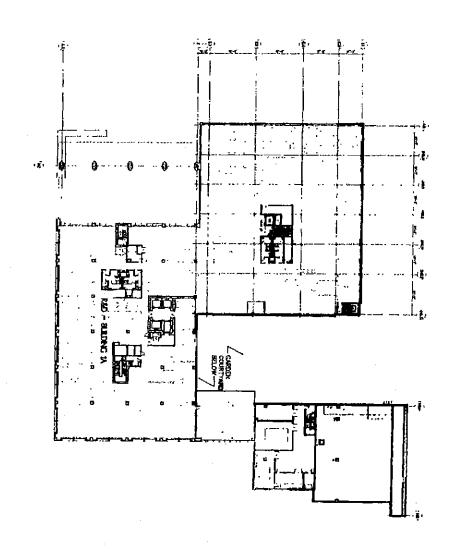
Exhibit C to Amended and Restated Ground Lease (Project Plan)
